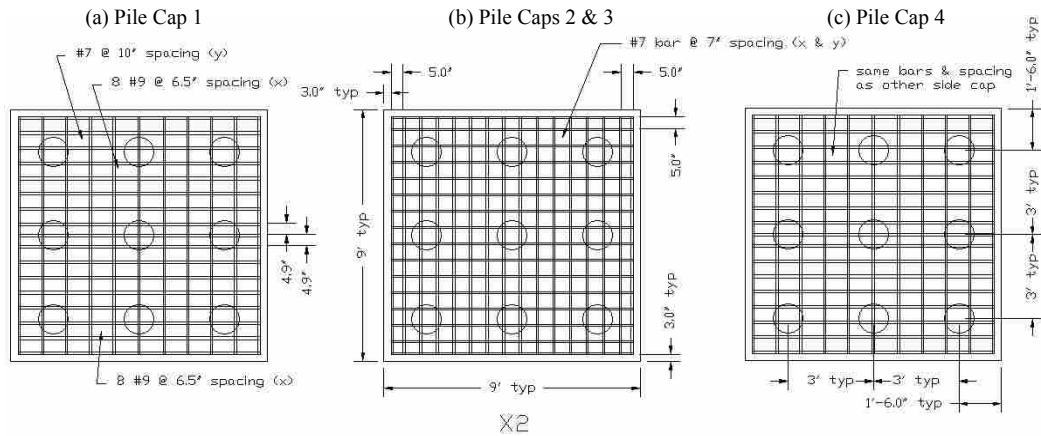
Layout of bottom reinforcing mat for the test pile groups.
